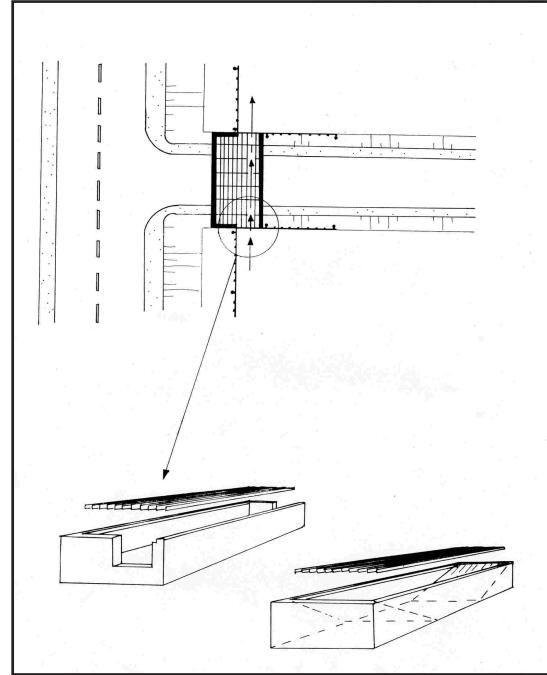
At road junctions, U-shaped tunnels (0.4 m deep and 0.3 m wide) covered with iron bars or a grid (60 x 100 mm) are necessary to join the guiding structures which would otherwise be cut by the side road where it joins the main road.
